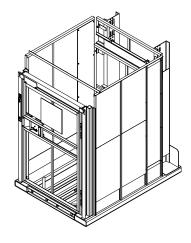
Swing Gate, Single Panel, Carriage Mounted, Slide Latch
